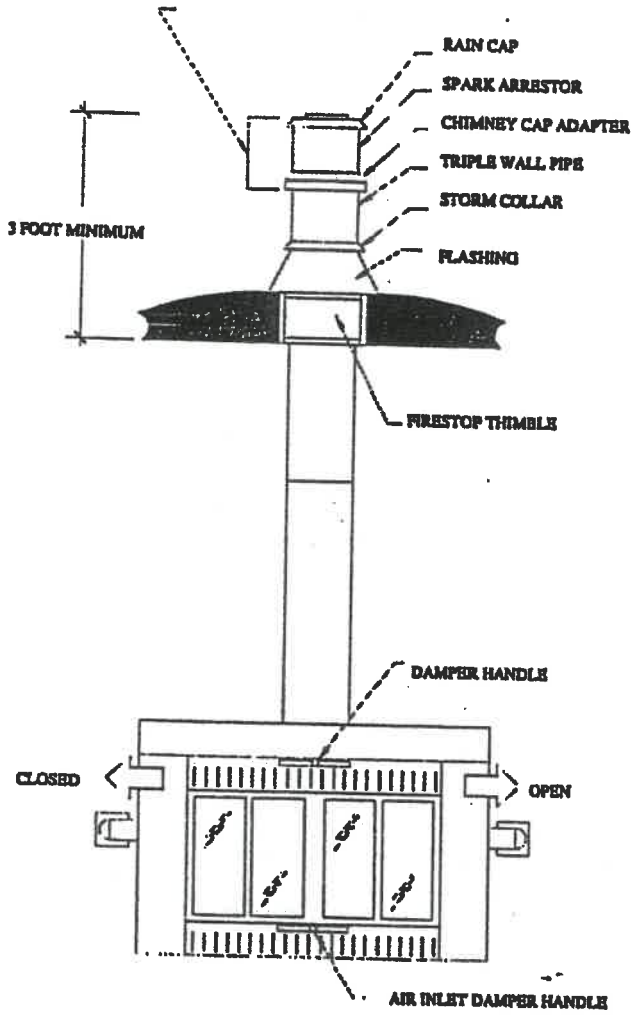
FIREPLACE CHIMNEY AND AIR INTAKE INSTALLATION
